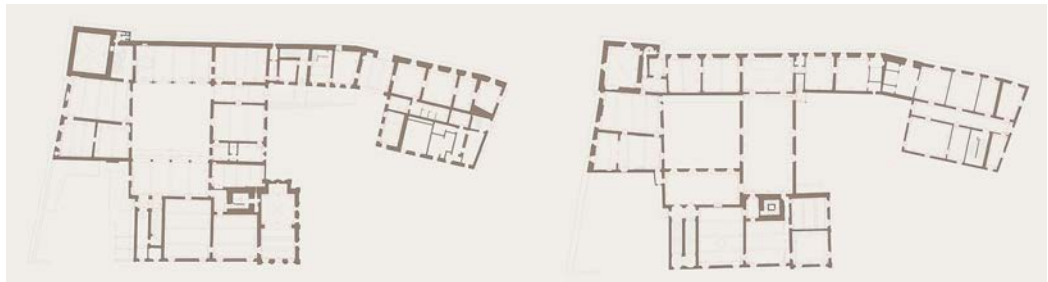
Plan of the ground floor and second floor of the Rocca, in scale 1:50.
